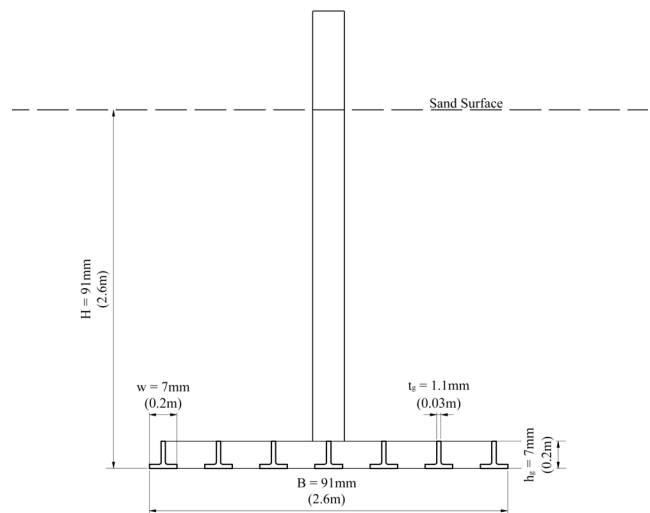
Dimension of 1:28 centrifuge model grillage (prototype dimensions shown in brackets)
